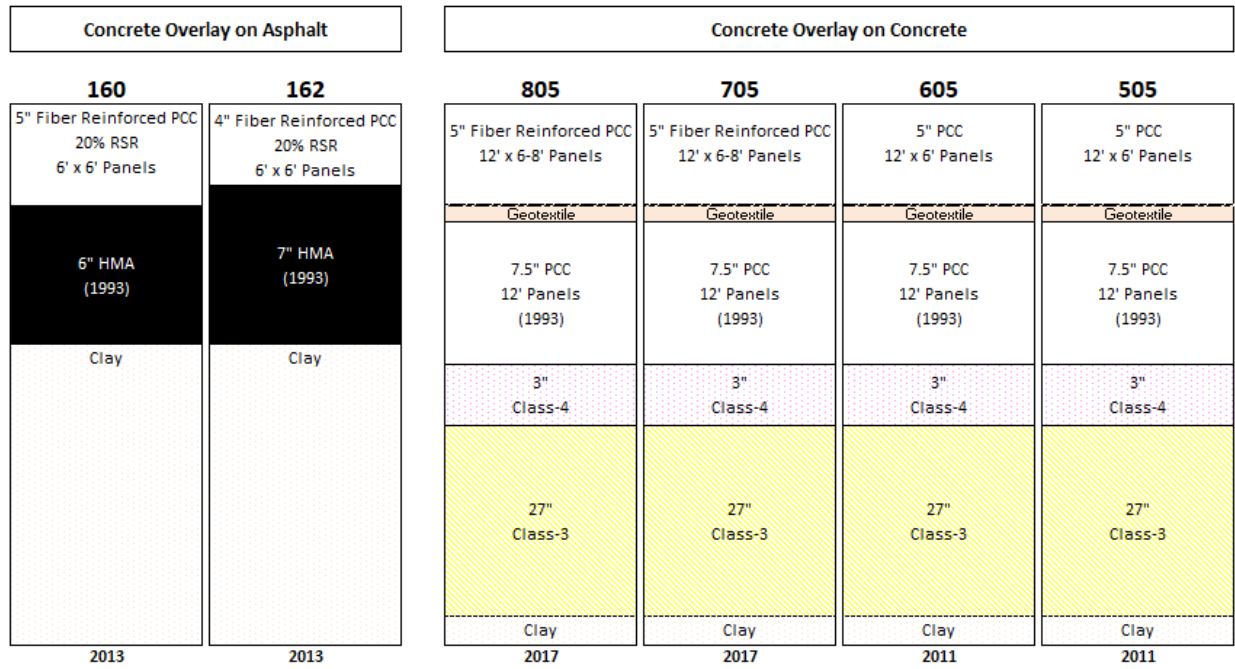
Cross-section Design of Concrete Repair Test Sections
